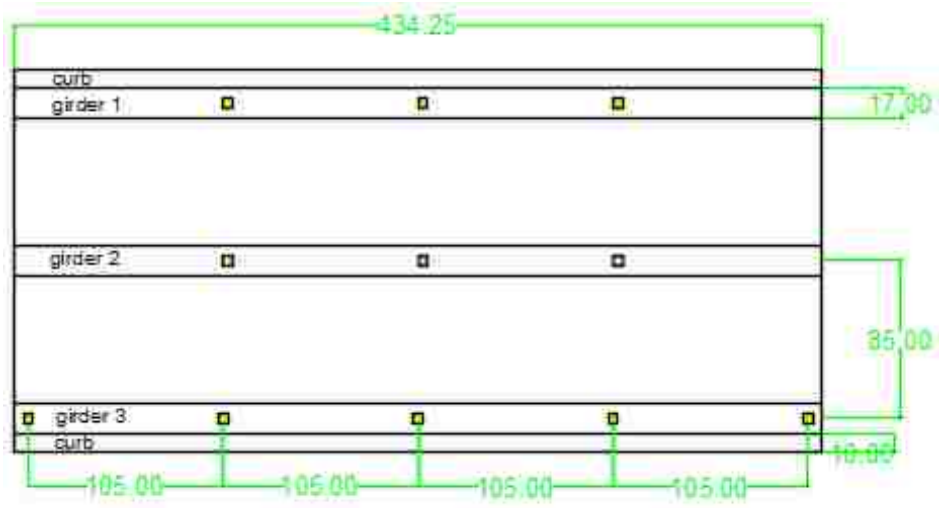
Span 1 Prism Layout (Dimensions shown in inches, 1 in. = 25.4 mm)
